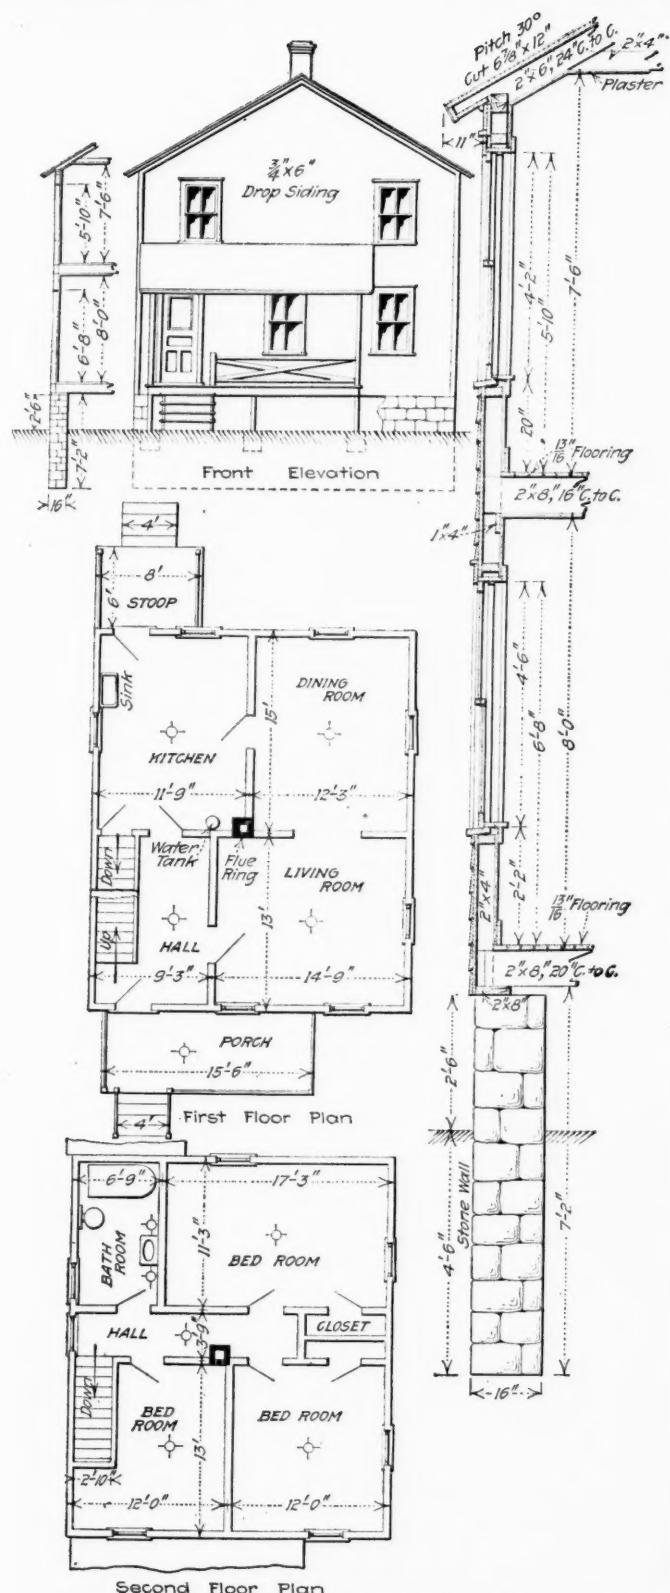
DETAILS OF TWO-STORY SINGLE HOUSE
